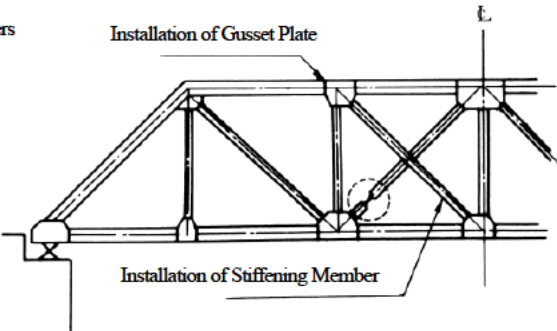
Installation of Stiffening Members (Example 2:Installtion of Stiffening Member)
